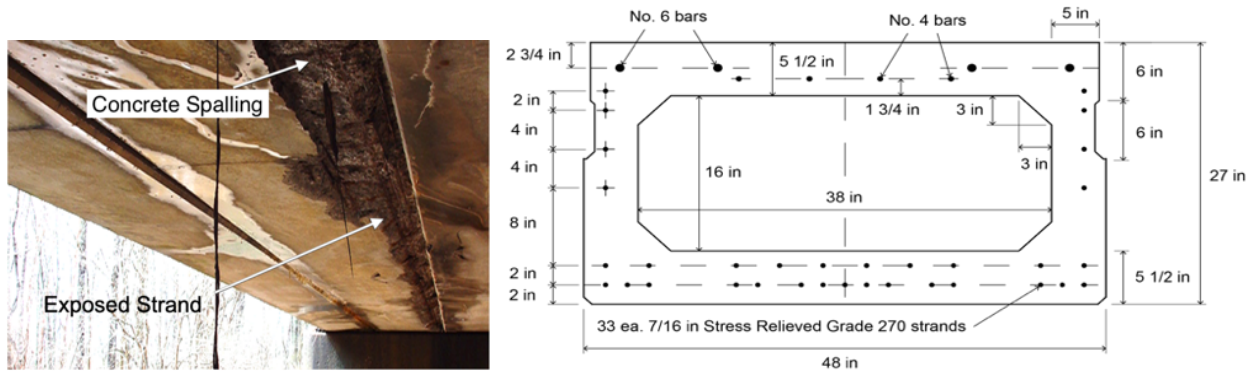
Typical corrosion damage on Aden Road Bridge (left), Cross-section of Aden Road Bridge Box Beams (right)
